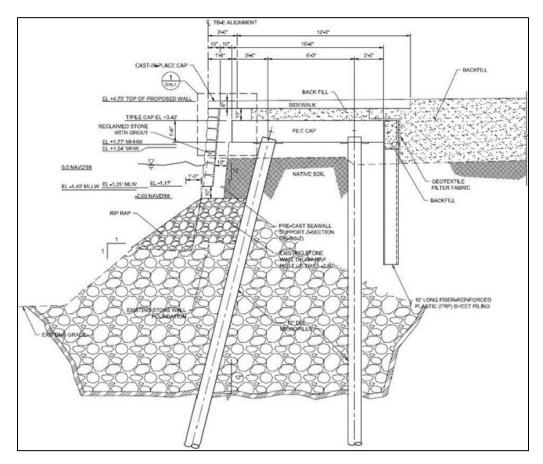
Tidal Basin East – Proposed Seawall Section (Typical)
